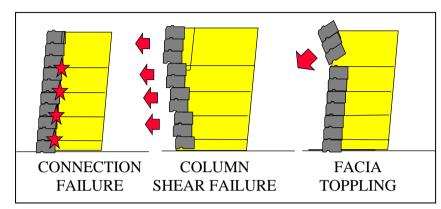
FACIA STABILITY OF BLOCK WALLS CONSISTS OF
